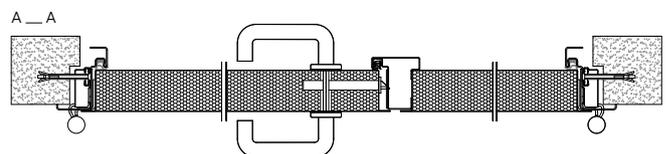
Horizontal cross-section at the door lock level of the ECO double-leaf solid steel seamless door with a frame
